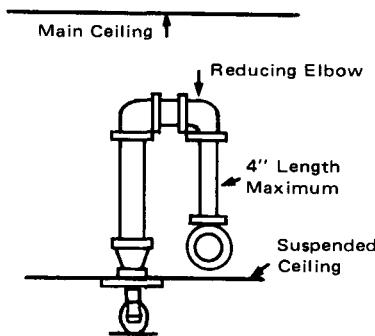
(a) Nipple and reducing elbow supplying sprinkler below ceiling.
